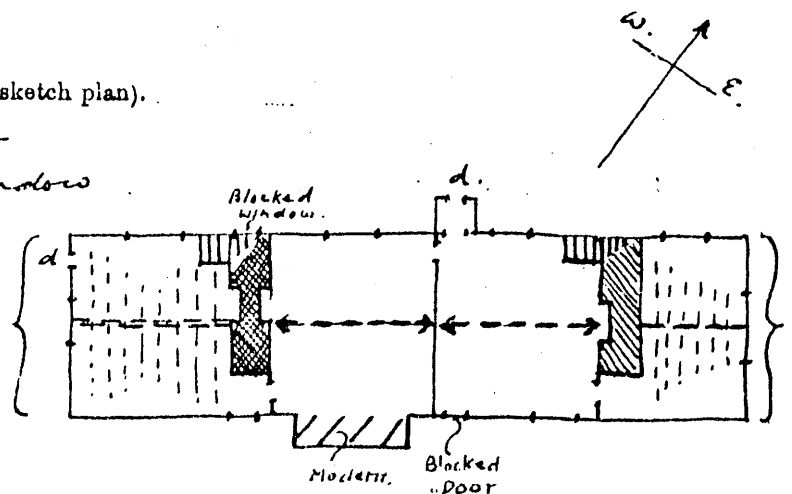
Sketch plan of Bectonswood farmhouse (RCHM, 1923)
